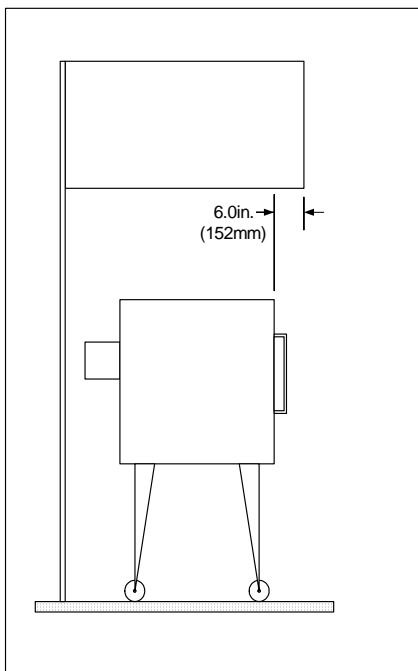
Line Drawing of 6.0 inches of Front Overhang for the Full-Size Oven Using a 4-Foot Deep Hood
